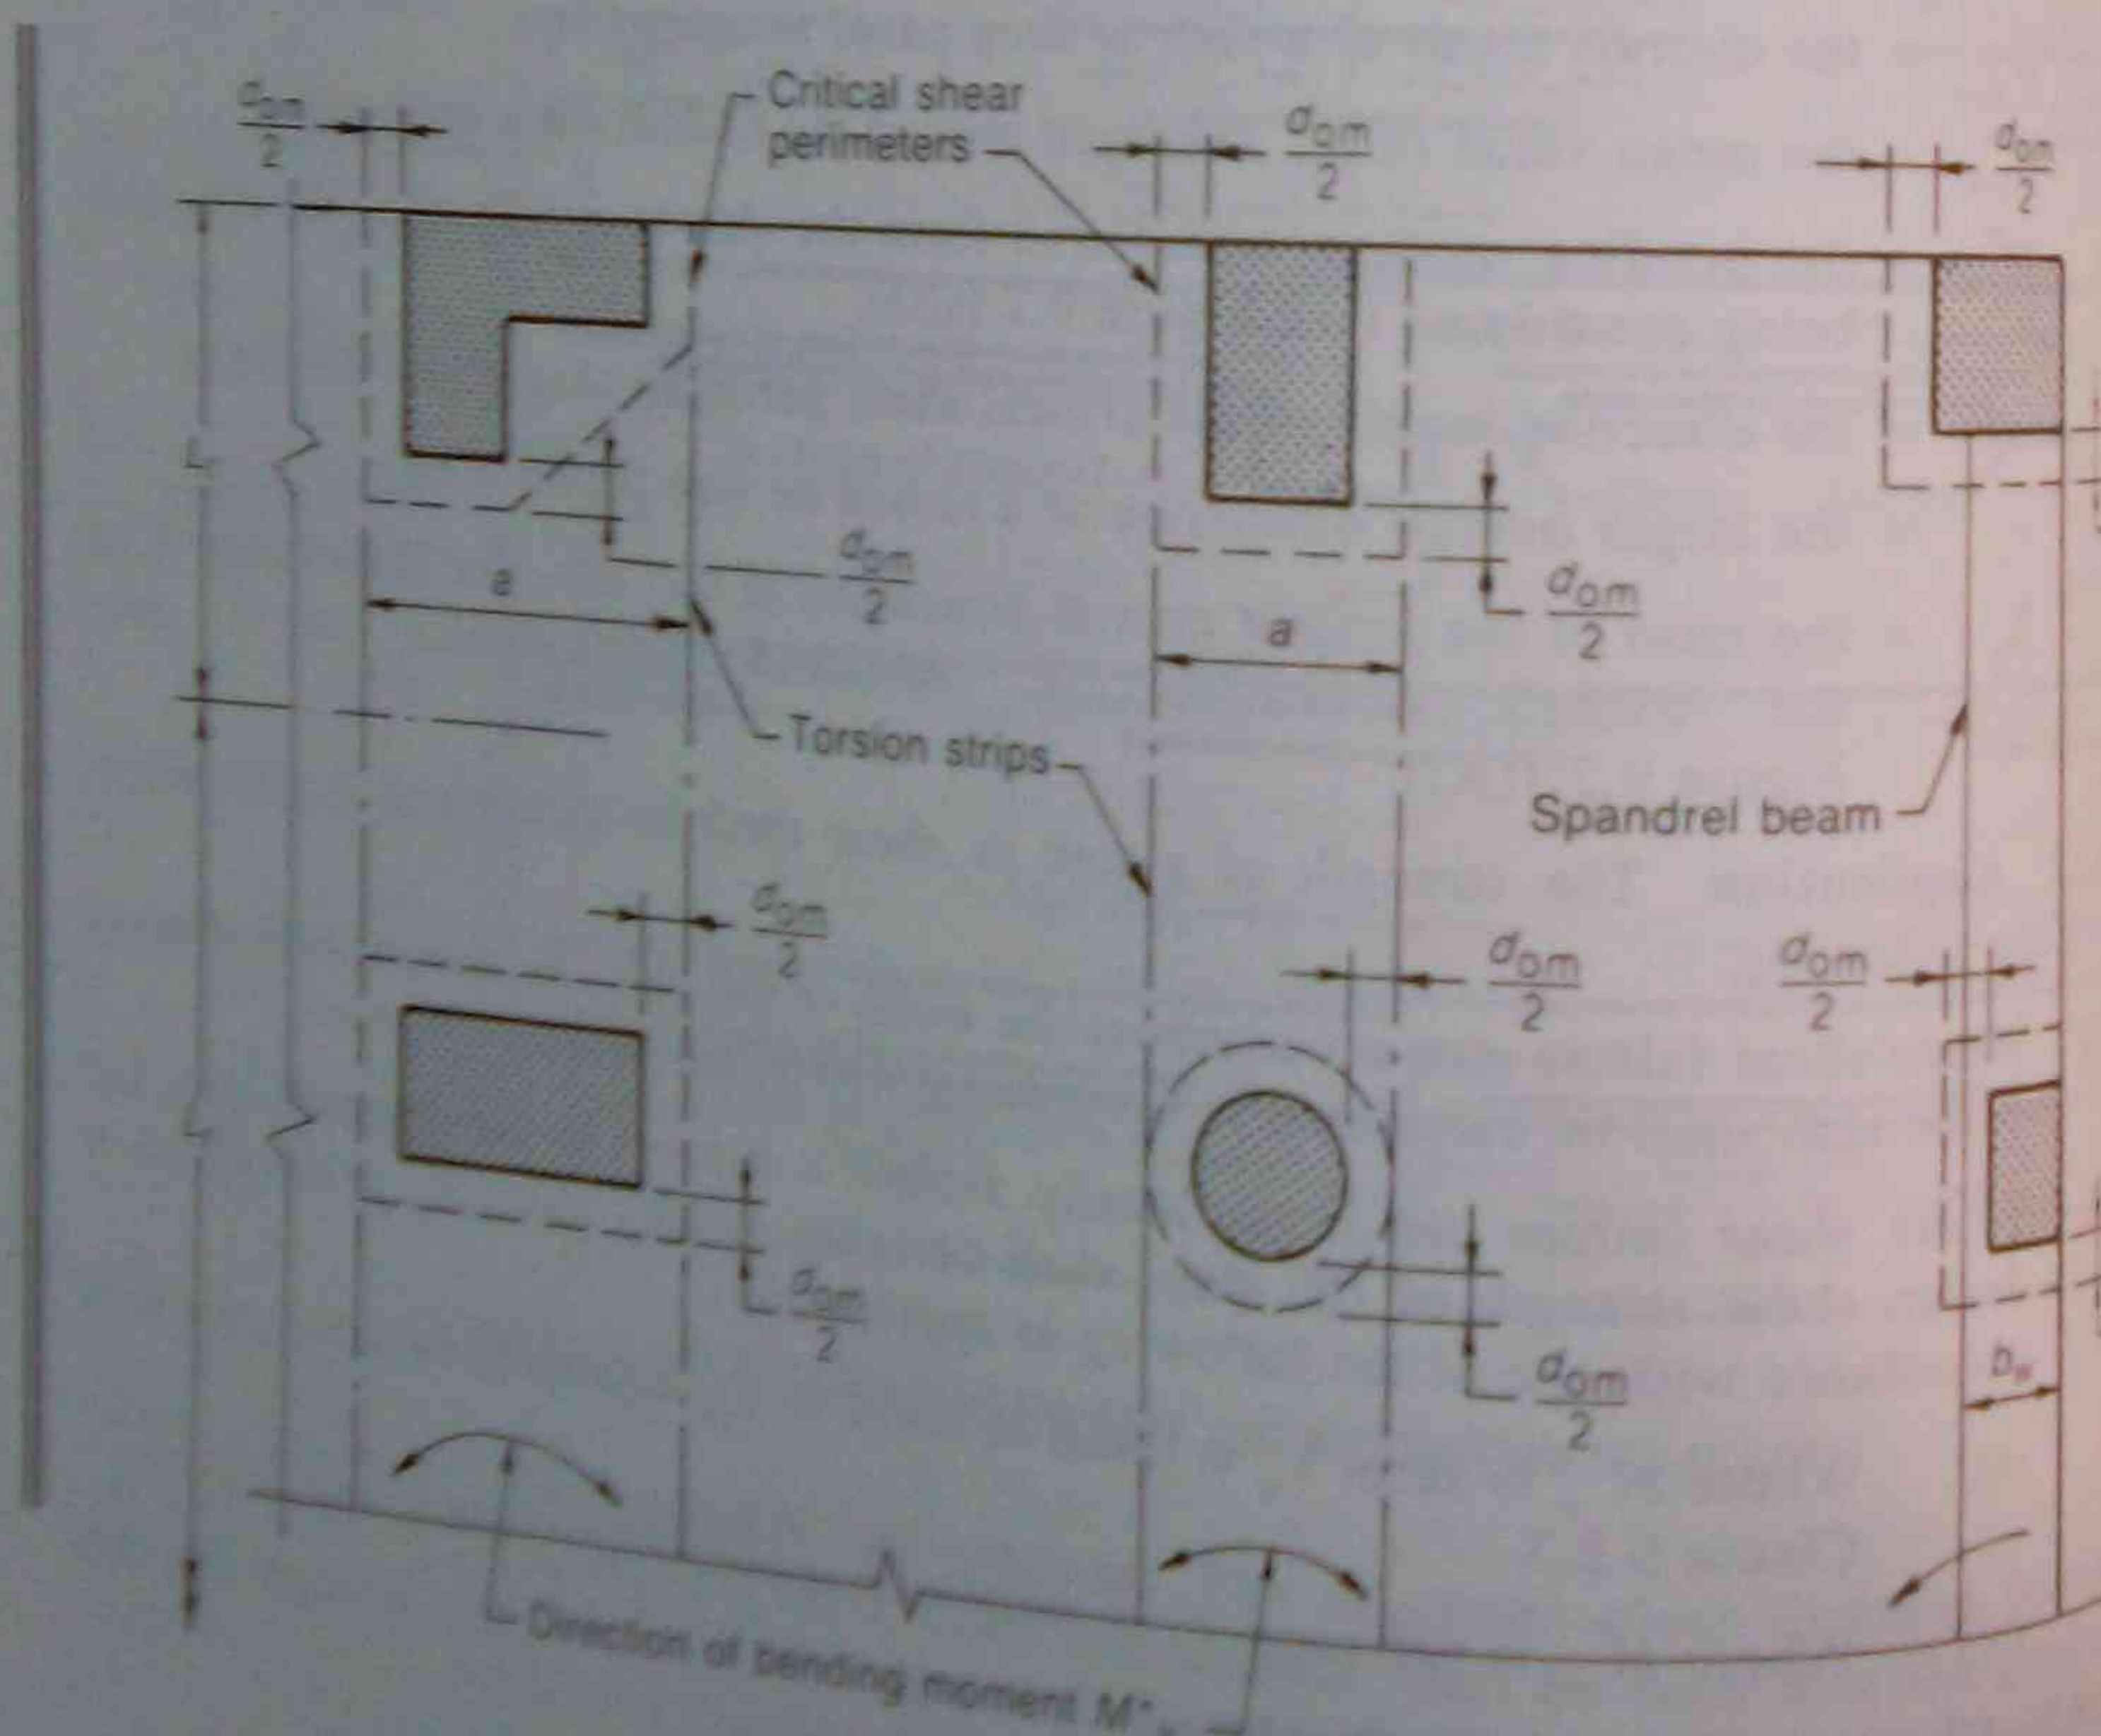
(B) TORSION STRIPS AND SPANDREL BEAMS
